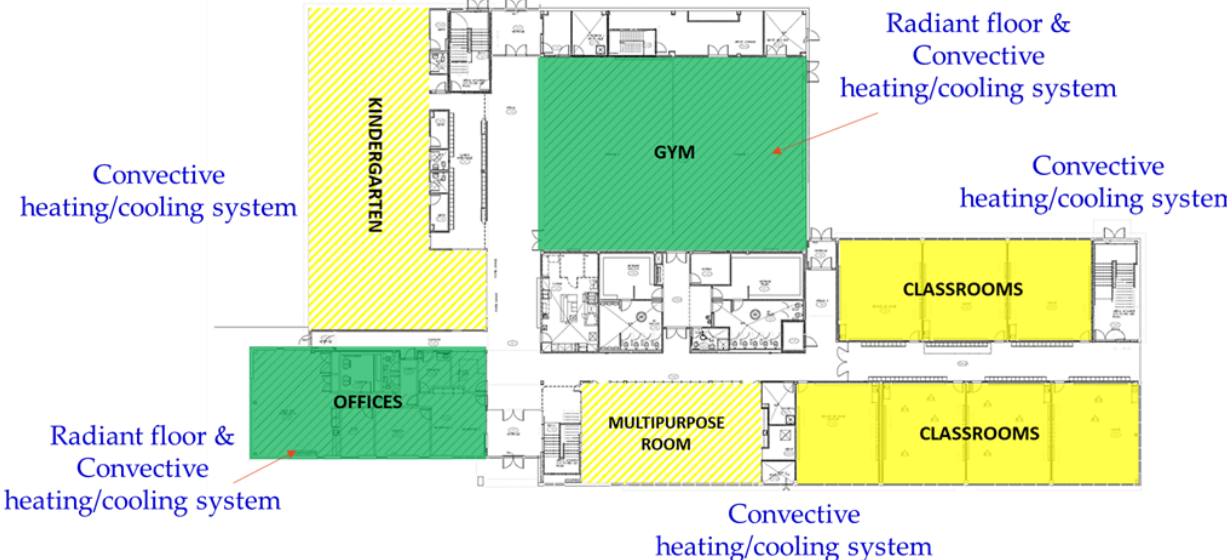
Plan view of the school and the HVAC system in each zones – First floor
